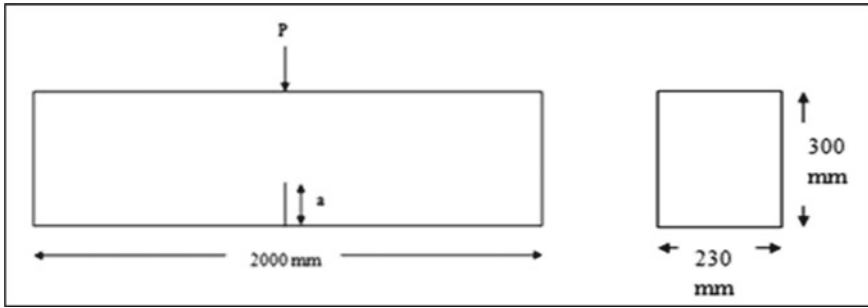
Reinforced concrete beam with through-thickness crack
